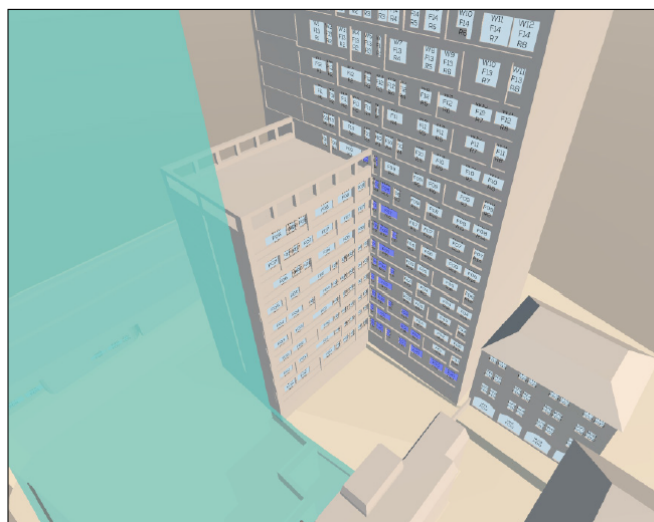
Windows on Impact House which would have a retained VSC below 15% shown in Purple.
